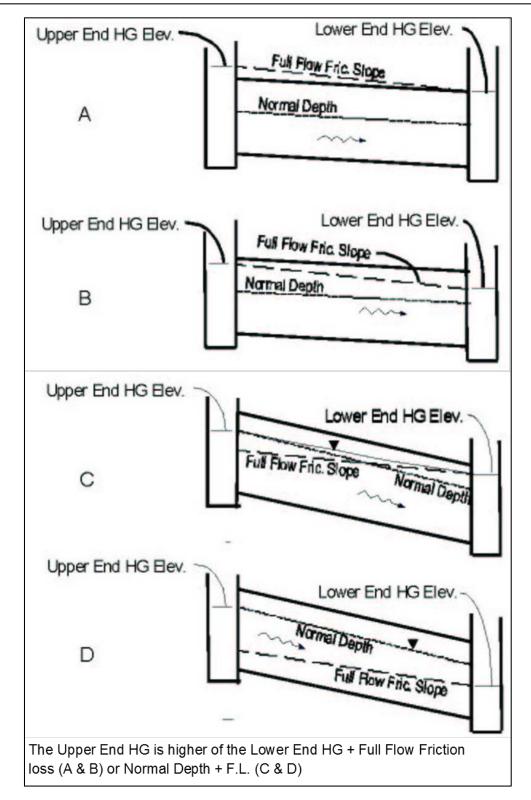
Determining the Upper-End Hydraulic Elevation
